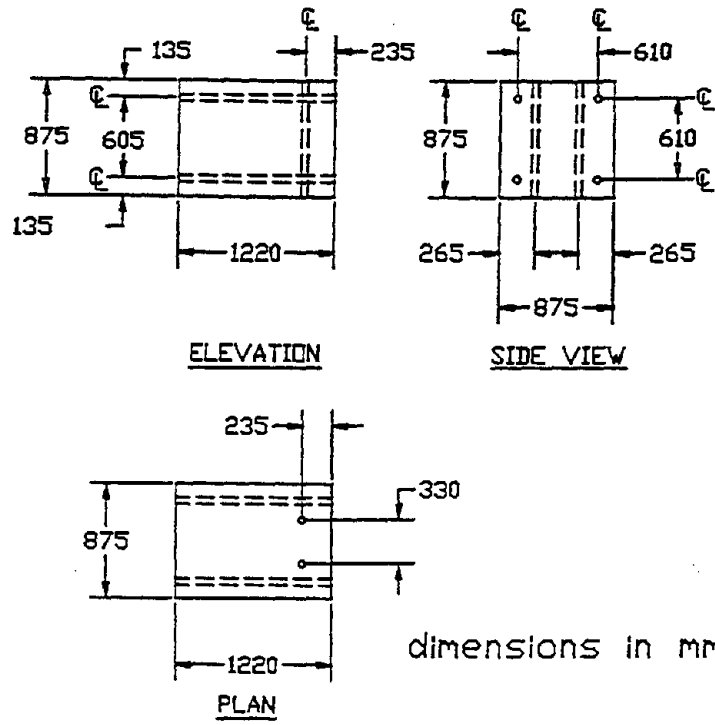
Dimensional Details of End-Block Attached to Right Side of Specimen
